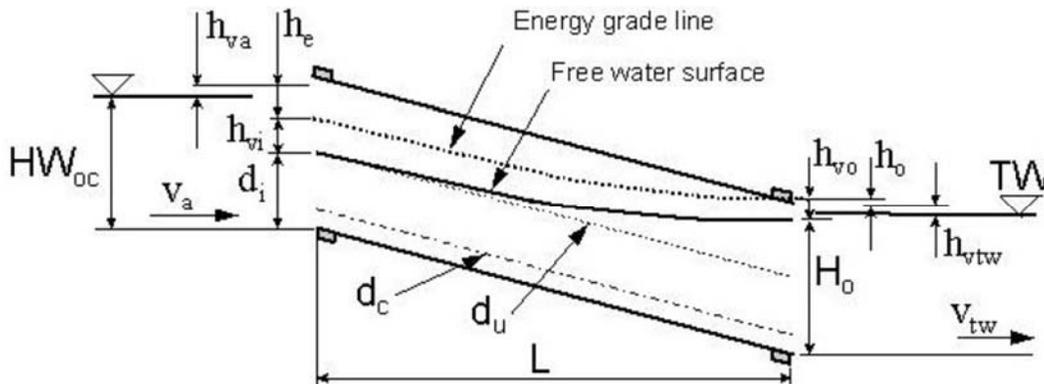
Outlet Control Headwater for Culvert with Free Surface
